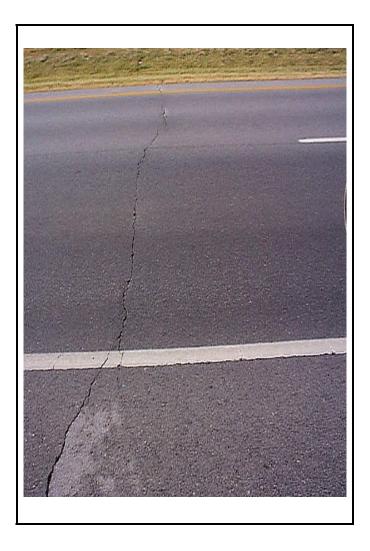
Transverse Cracking in Local Pavement, Low Severity
